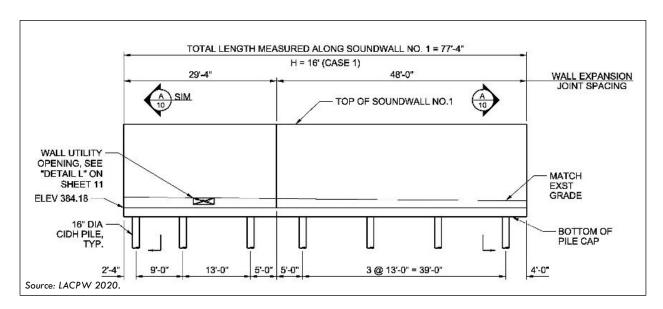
Cross-Section of Soundwall Section 1 showing CIDH Piles.
